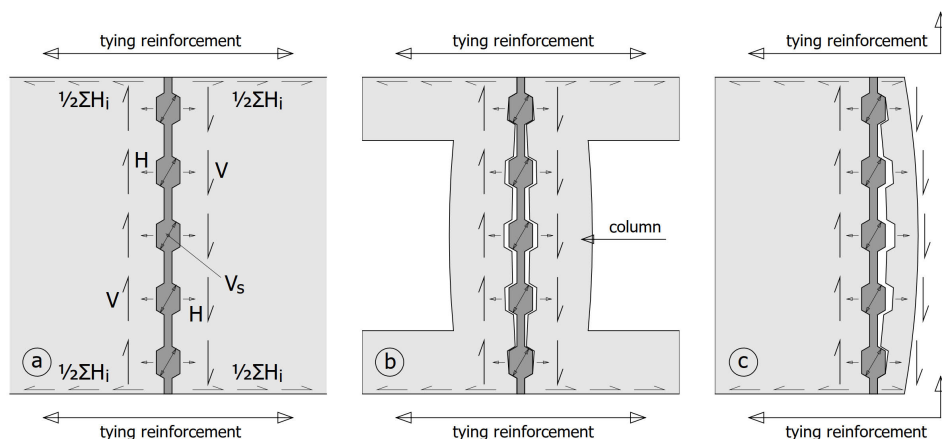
Horizontal stiffness of the surrounding precast concrete structure
